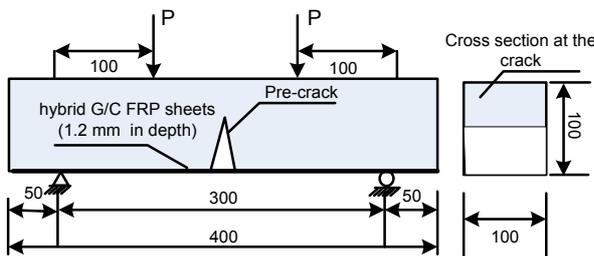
Dimensions of models and loading scheme (Unit: mm)
